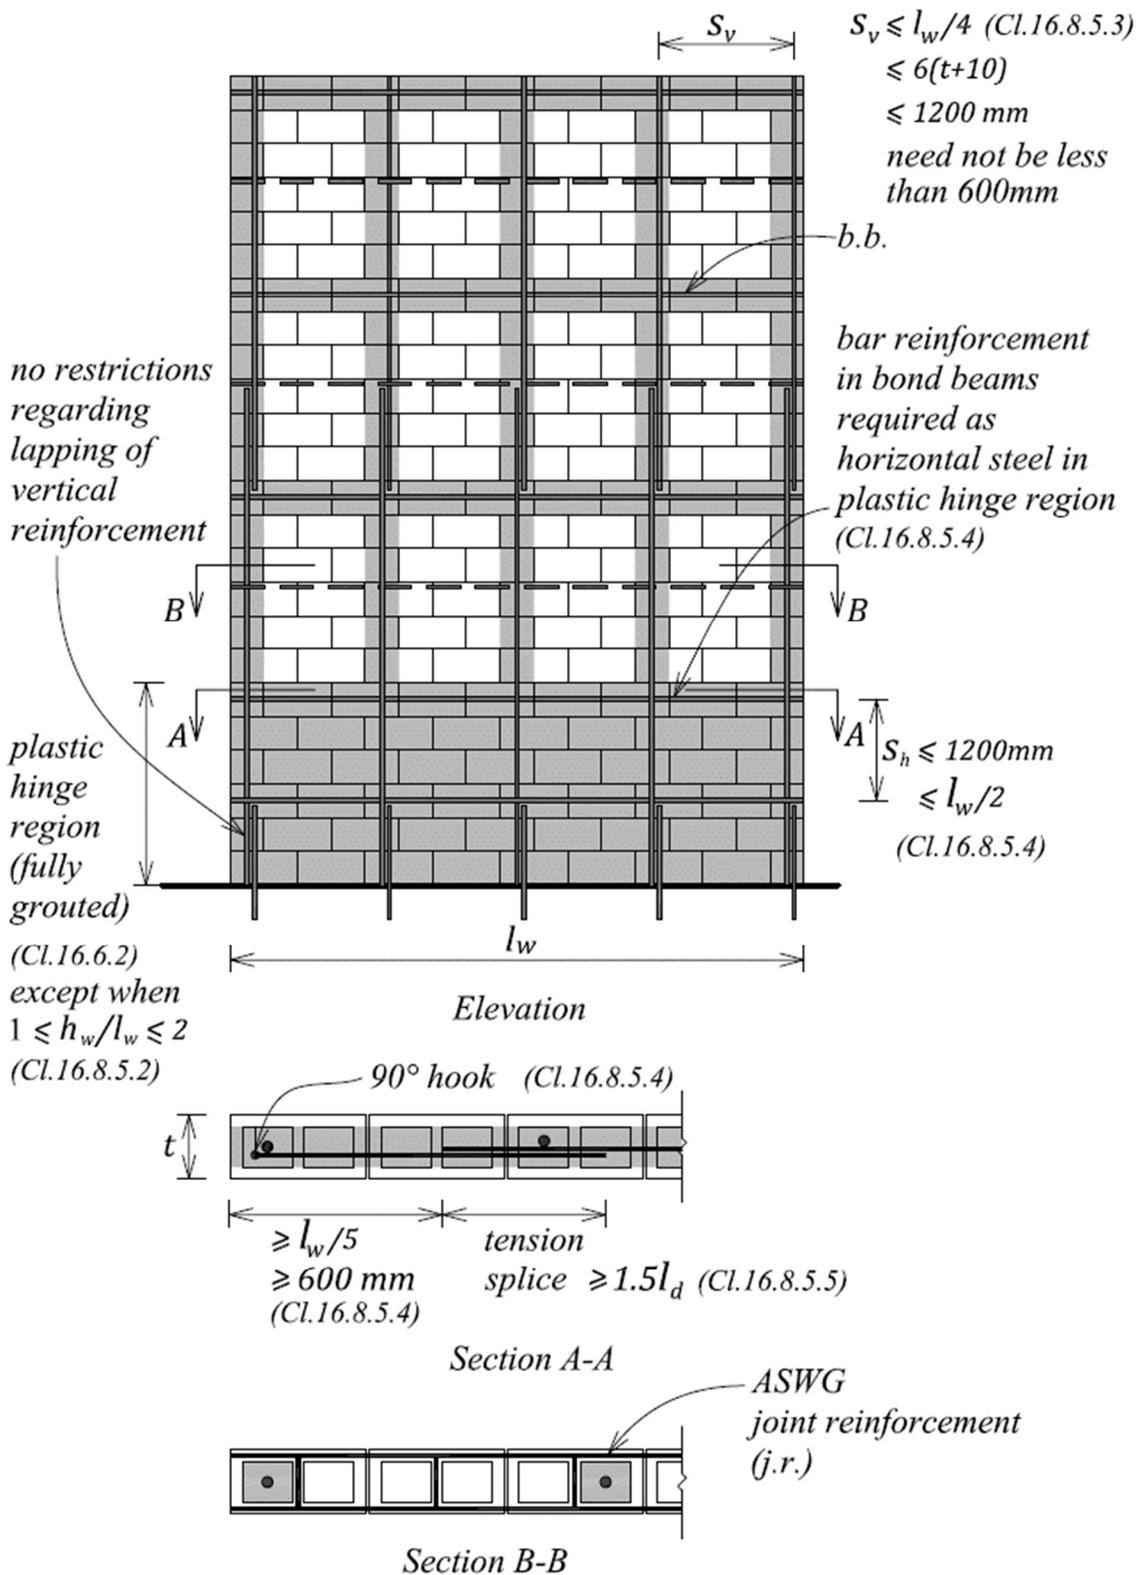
Moderately ductile reinforced masonry shear walls: additional CSA S304-14 seismic reinforcement requirements.
